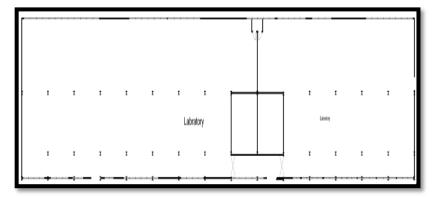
First Floor Plan, Physiology Department. Source: Author's sketch, 2016
